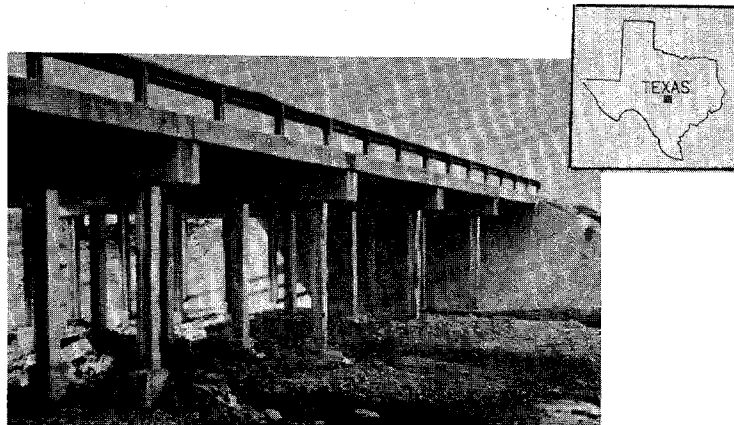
Upstream side of Cold Creek bridge, showing abrasion and impact damage to pile bents.
